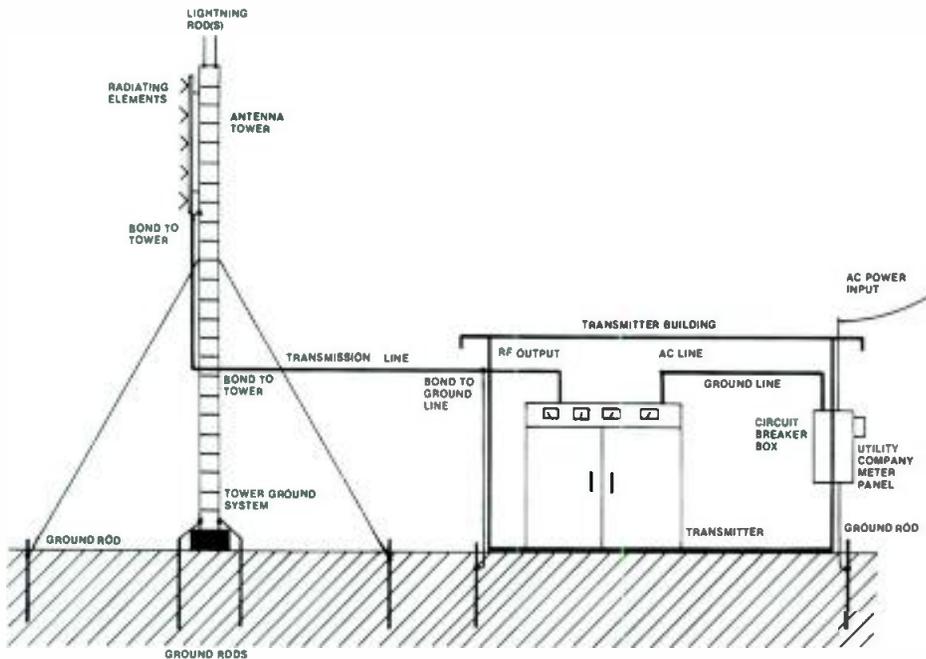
The typical, but not ideal, grounding arrangement for a transmission facility using a grounded tower. A better configuration involves the use of a bulkhead panel through which all cables pass into and out of the equipment building.
